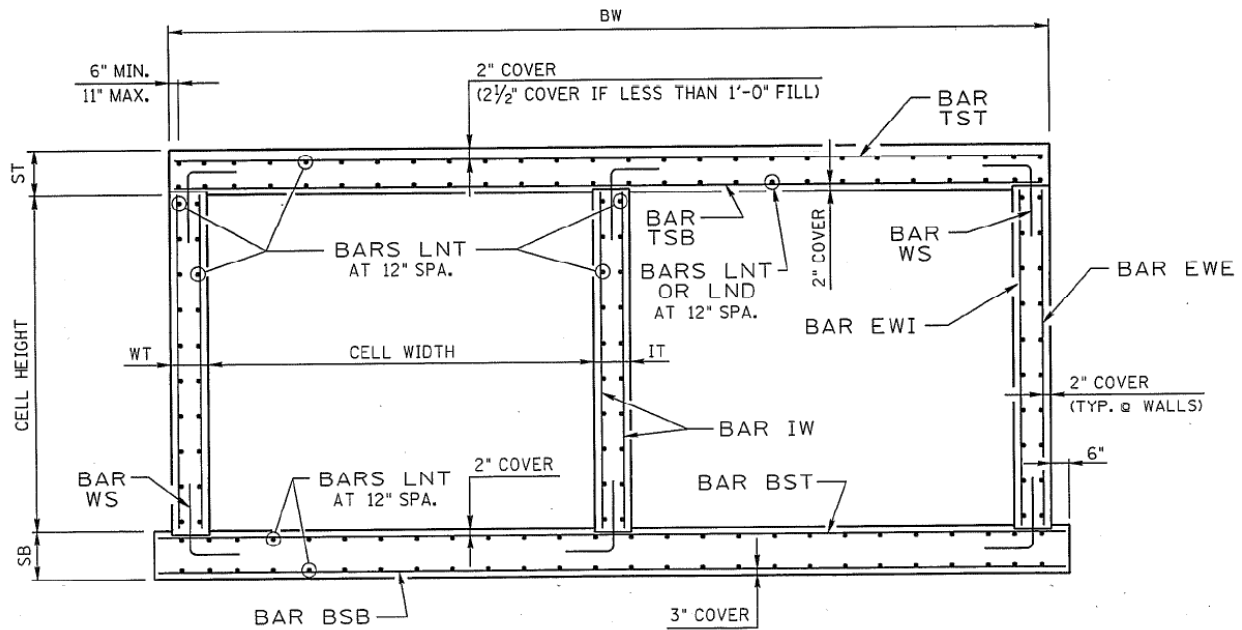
Typical TDOT Cast-in-Place Box Bridge Cross Section (TDOT 2000c)
